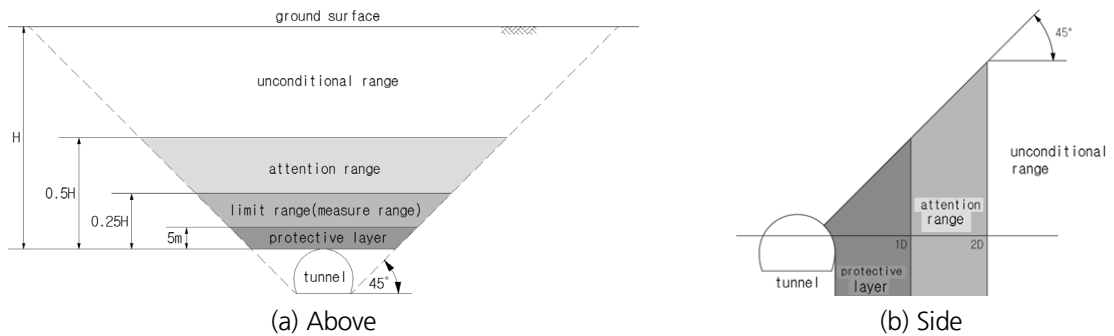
Influence zone of above and side of tunnel structure induced tunnelling
